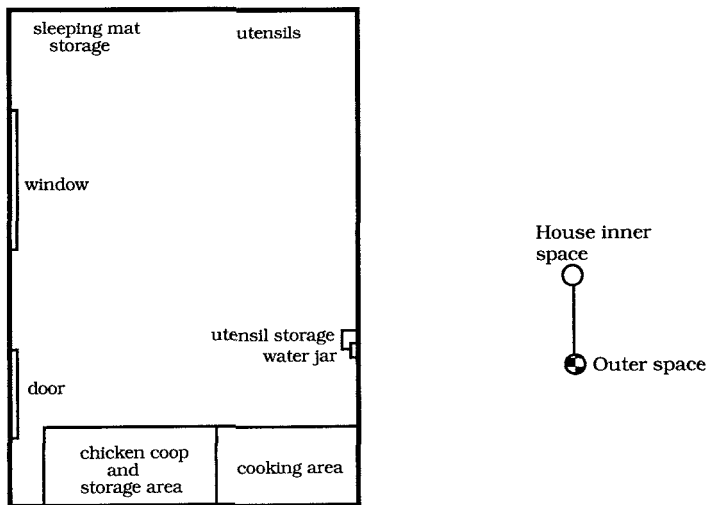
A Floor Plan of a One Room Betsileo House and its Respective Permeability Graph; from Kus (1990, 25)
